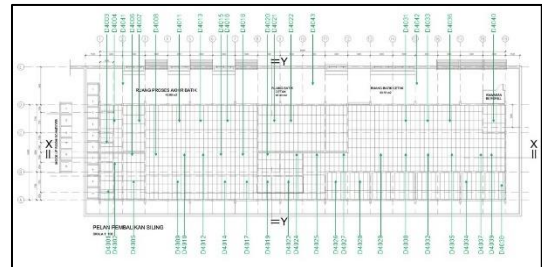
Ceiling plan with defect tagging of ceiling dilapidation in Block D SMPKVSA
